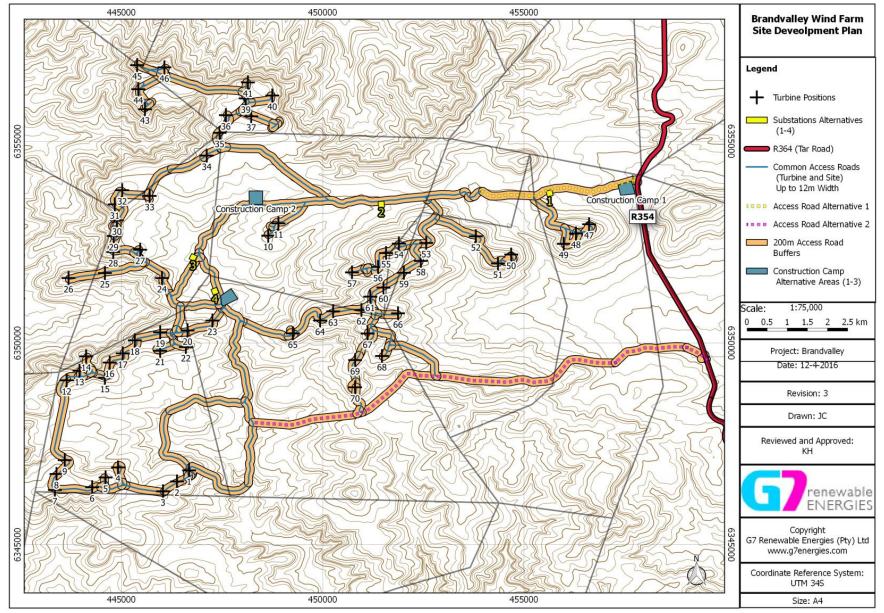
Conceptual Layout inclusive of construction camp, access road, substation alternative and turbine positions.
